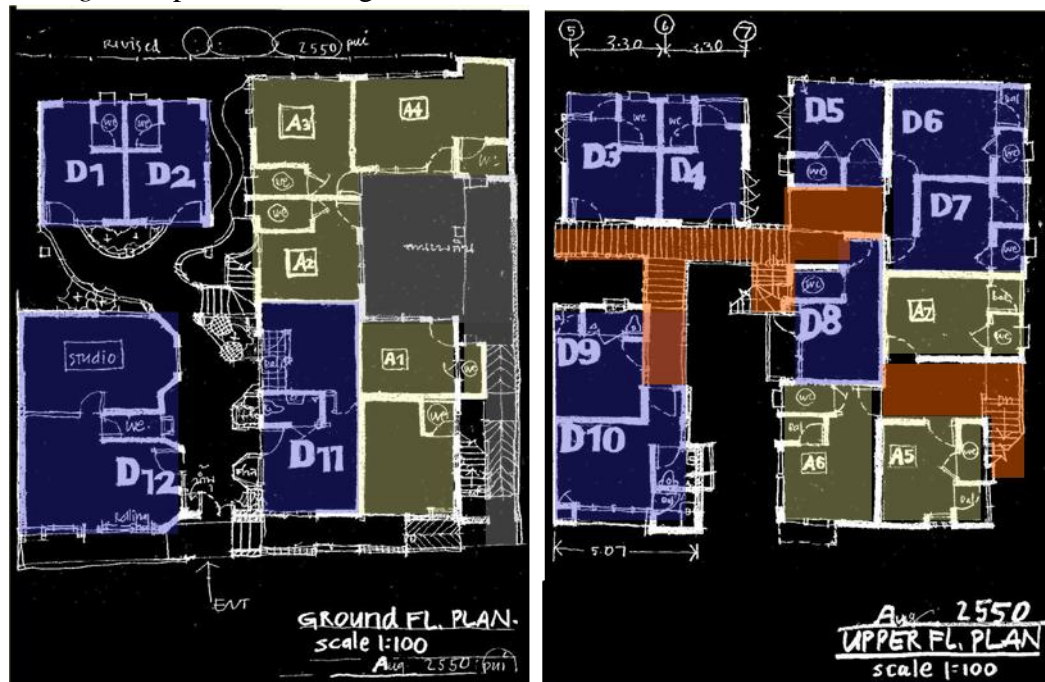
The floorplans of the ground floor (left) and the typical upper floors (right) of the “soi resort” as designed by Pui in 2007 (© Chatsiri Thanmarom)
